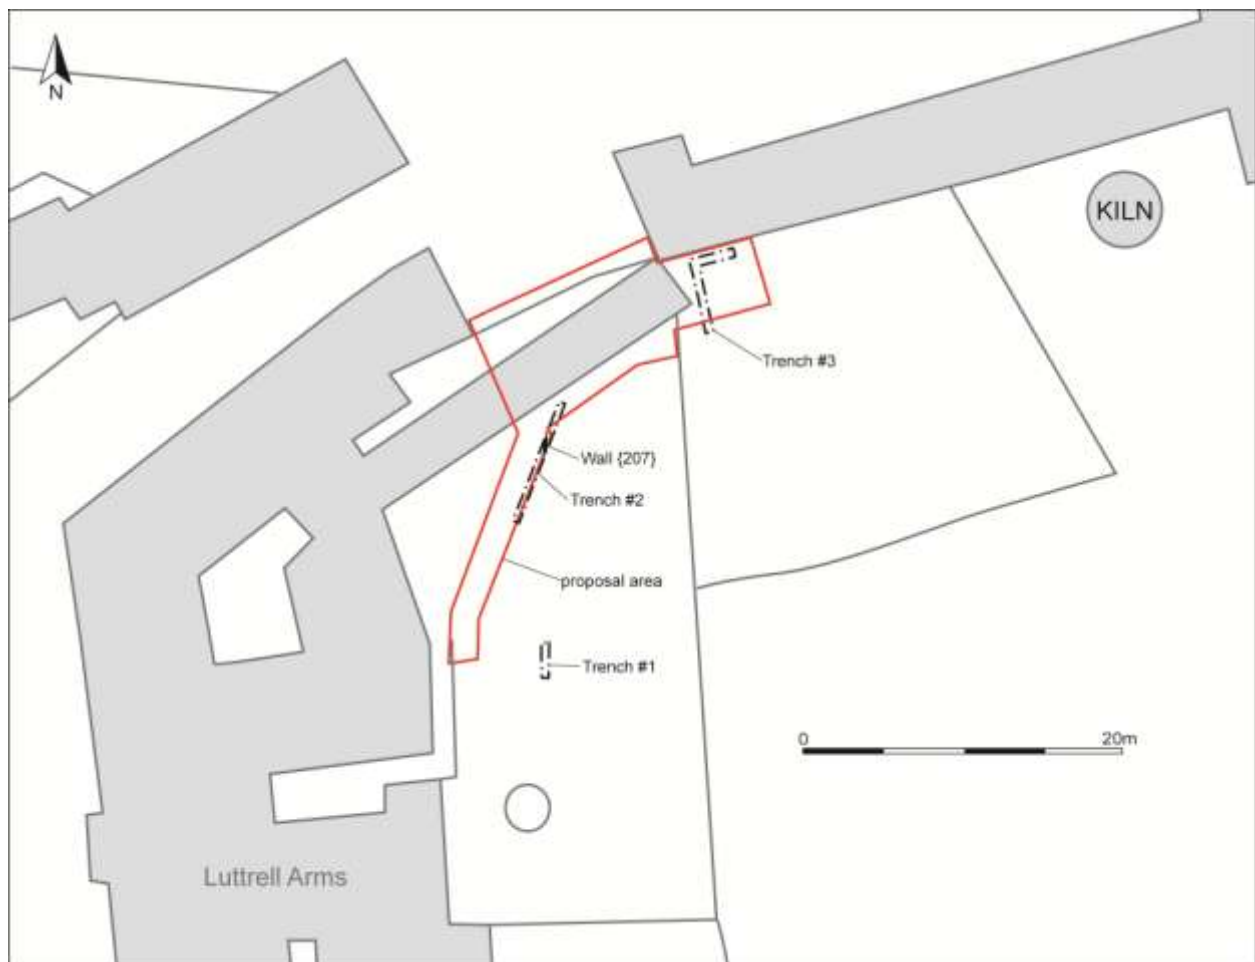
Trench plan, showing the location of the evaluation trenches and proposal area.
